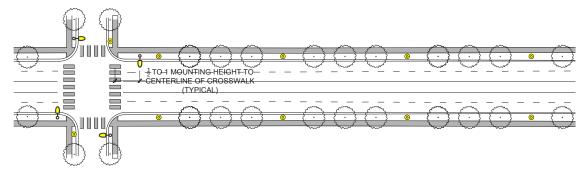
Typical Collector Street with Non-Continuous Pedestrian Lighting Plan
